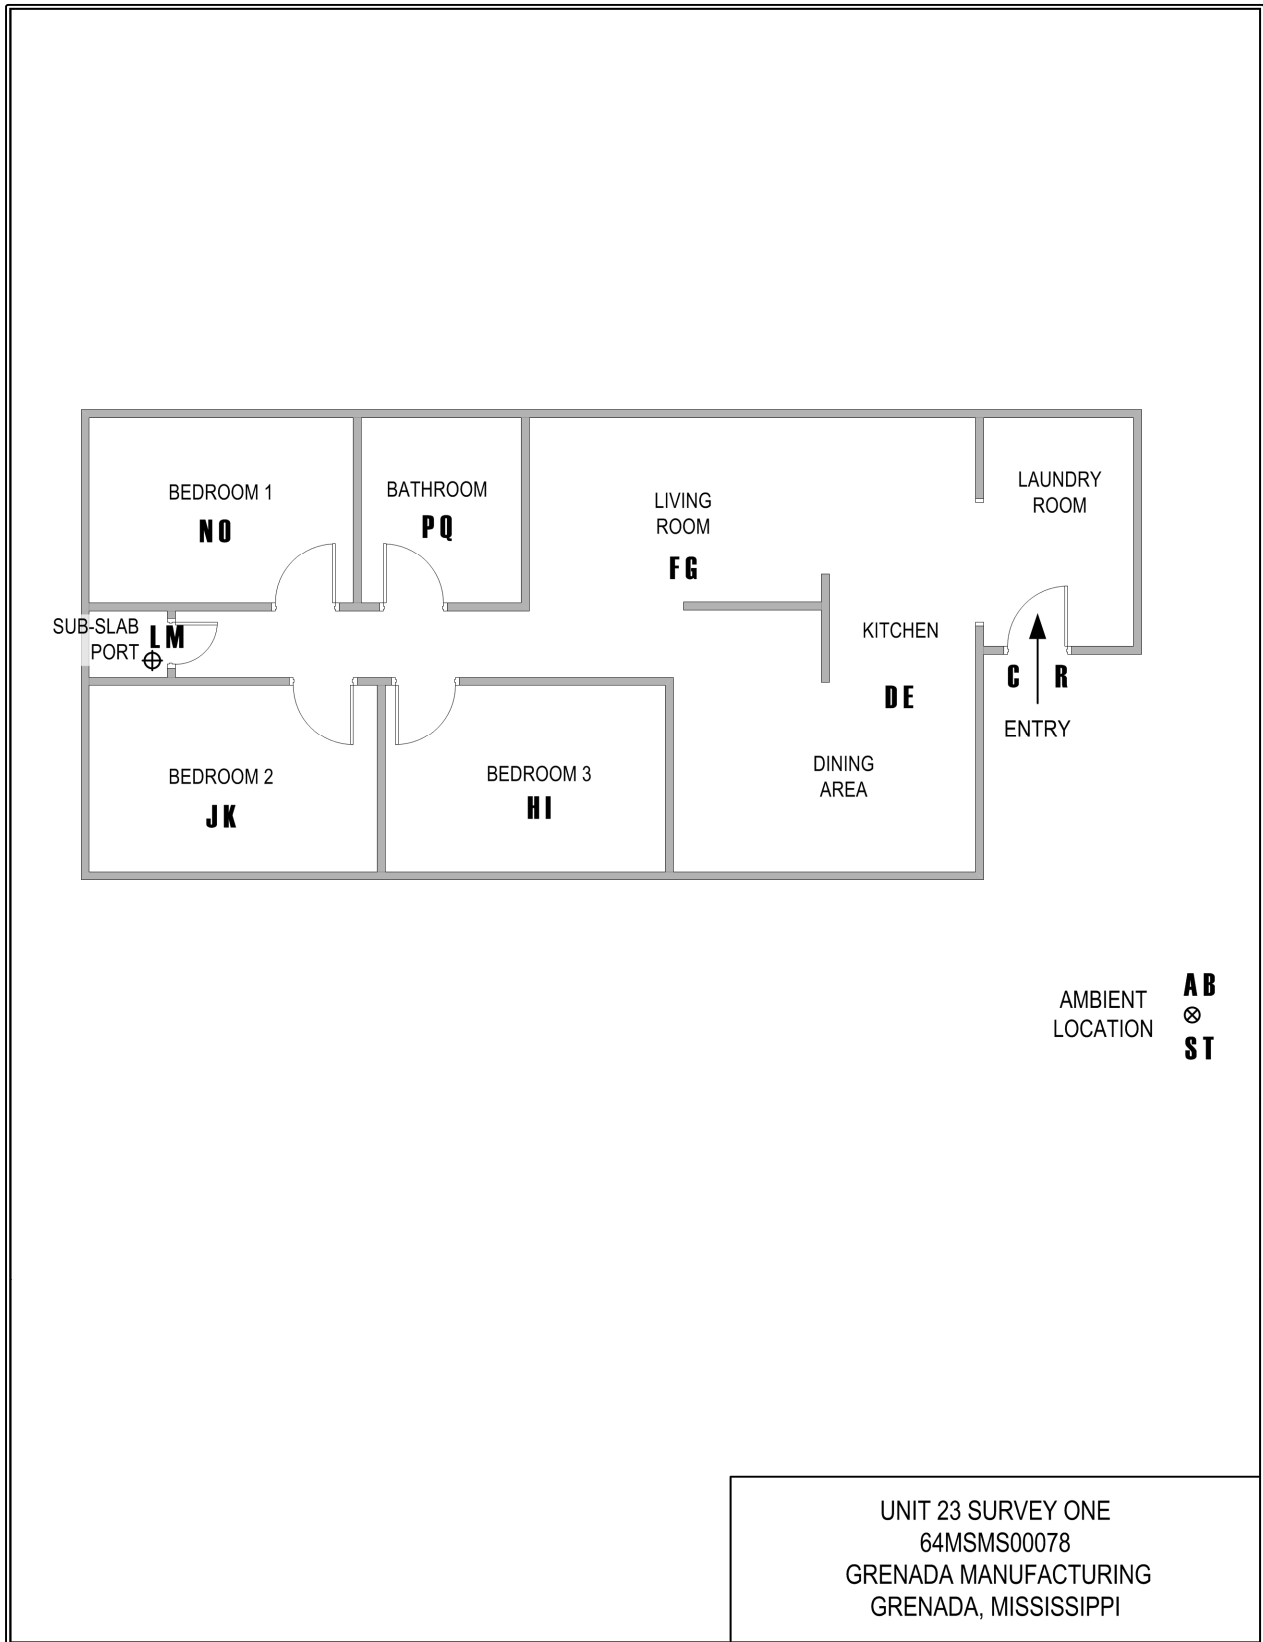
Unit 23 Survey One Floor Plan, 64MSMS00078
